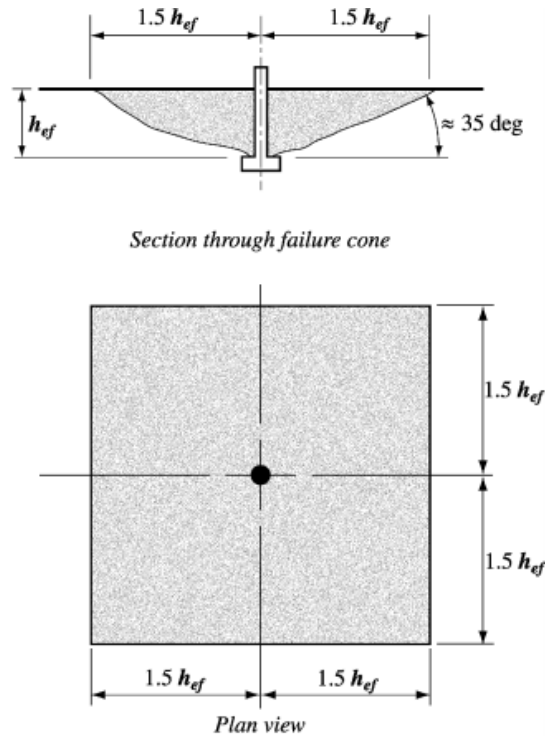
Failure cone for concrete breakout strength, A_{No} (ACI 2008).
